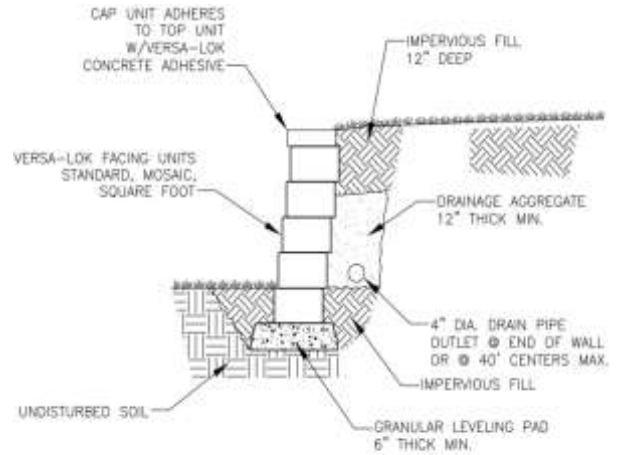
TYPICAL SECTION—UNREINFORCED
